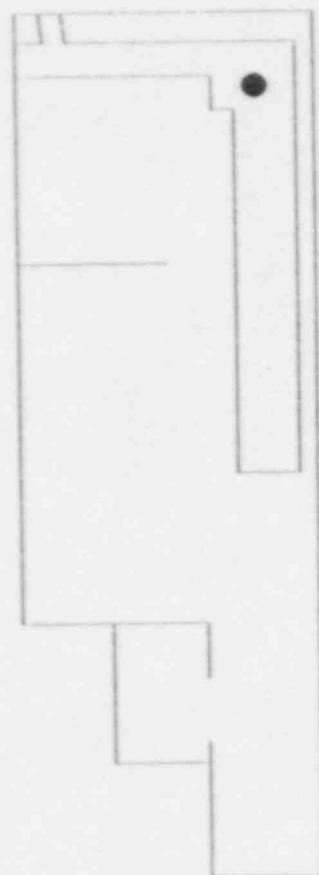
Hallway (Area 24) Showing Trench Soil Sampling Locations
